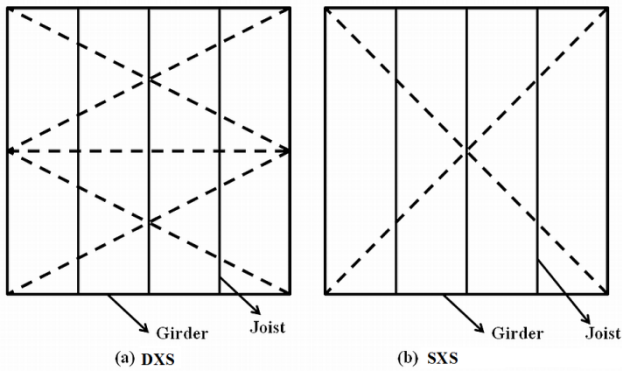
Two-way jack arch slab using steel grid (Maheri and Rahimi 2003)
